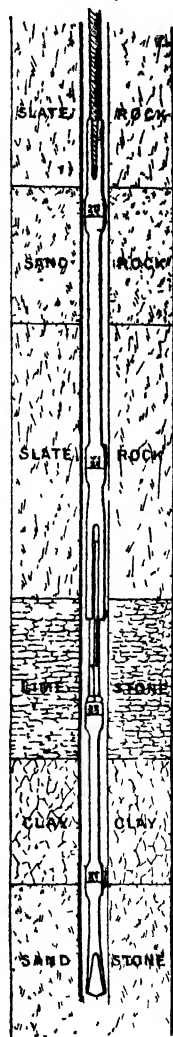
SECTION SHOWING AMERICAN ROPE-BORING TOOLS.
